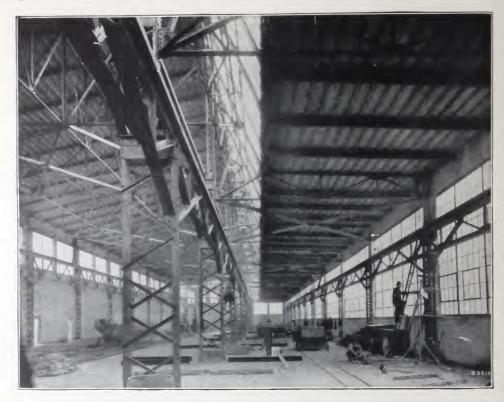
American Steel & Wire Co.'s fabric is used exclusively in the manufacture of all concrete roof tile produced by the Federal Cement Tile Co. of Chicago.
